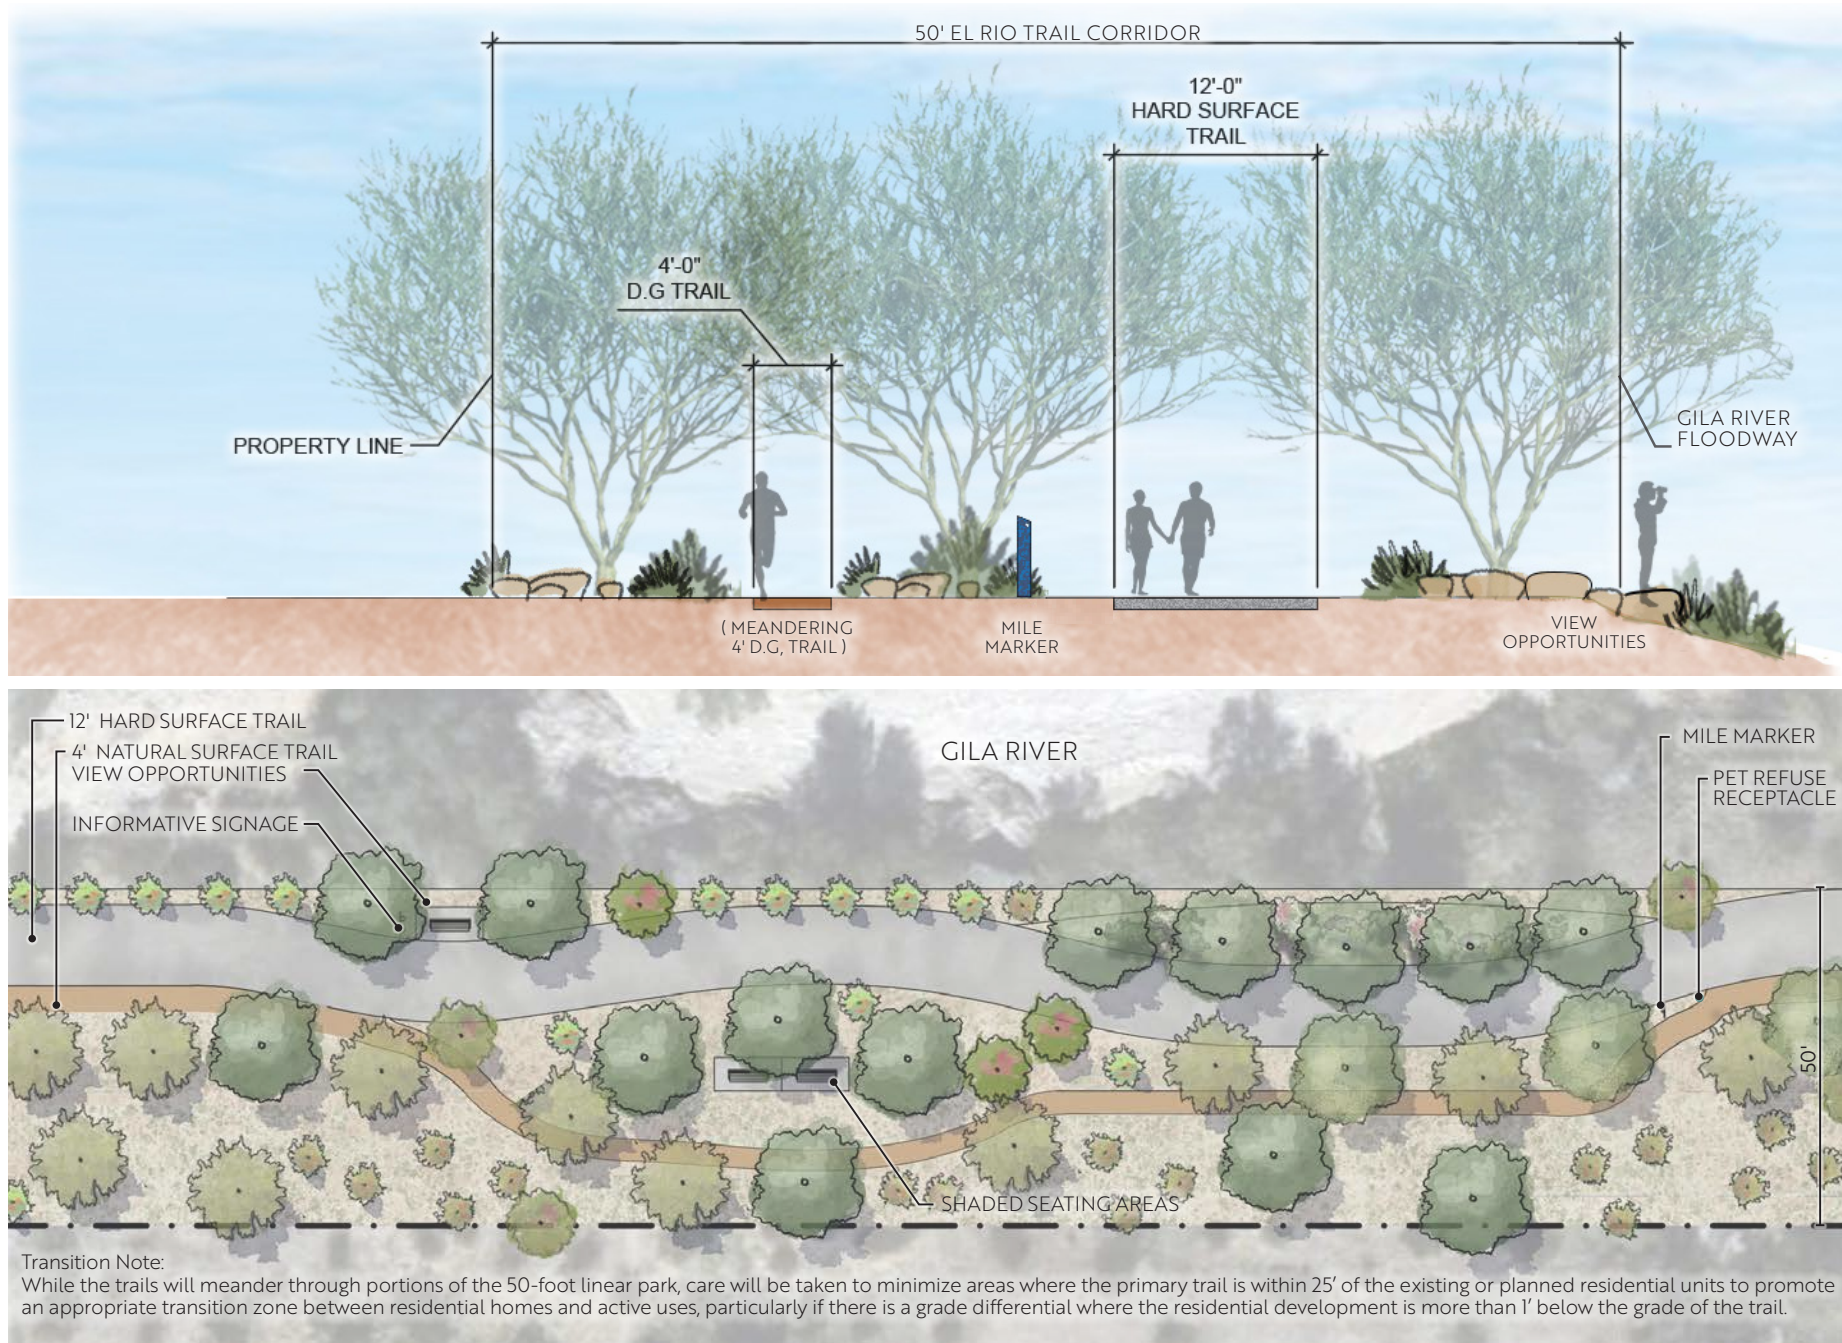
EL RIO LINEAR PARK - CONCEPTUAL PLAN & SECTION
